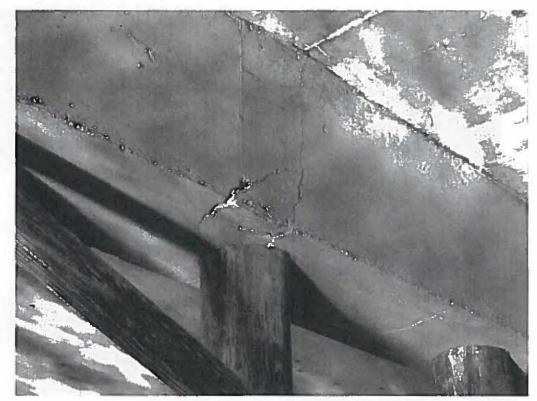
Delamination crack on the East side of pile cap #4, above pile #4.
